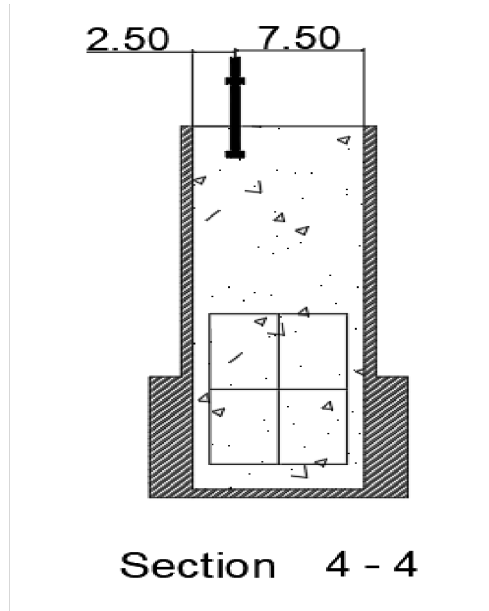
Specimen Sections (4-4), all dimensions in inch.
